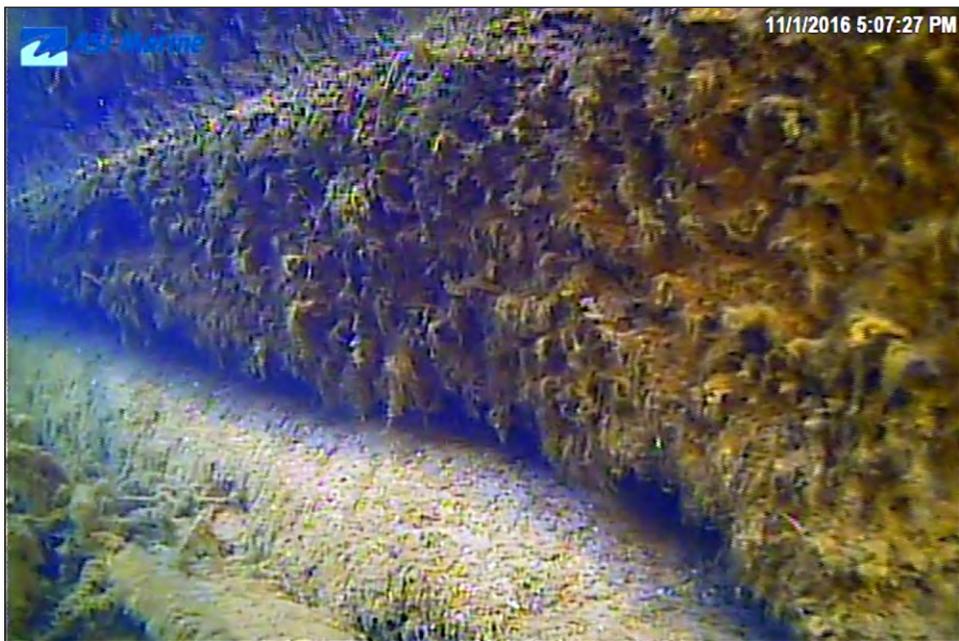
B-18: 46 m - Undercutting at bottom to 55.5 m, lost visibility.
